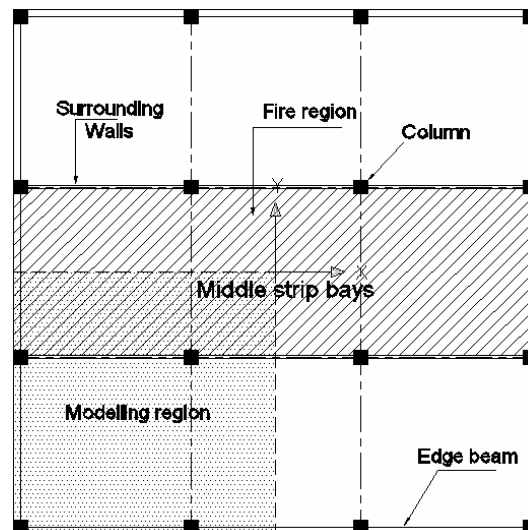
Plan view of the flat slab (middle strip bays exposed to the fire)
